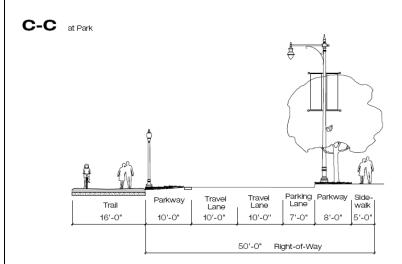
Porter County TND Street Section Classification "C-C": at Park featuring trail, parkway, travel lanes, parking lane, parkway and sidewalk.
